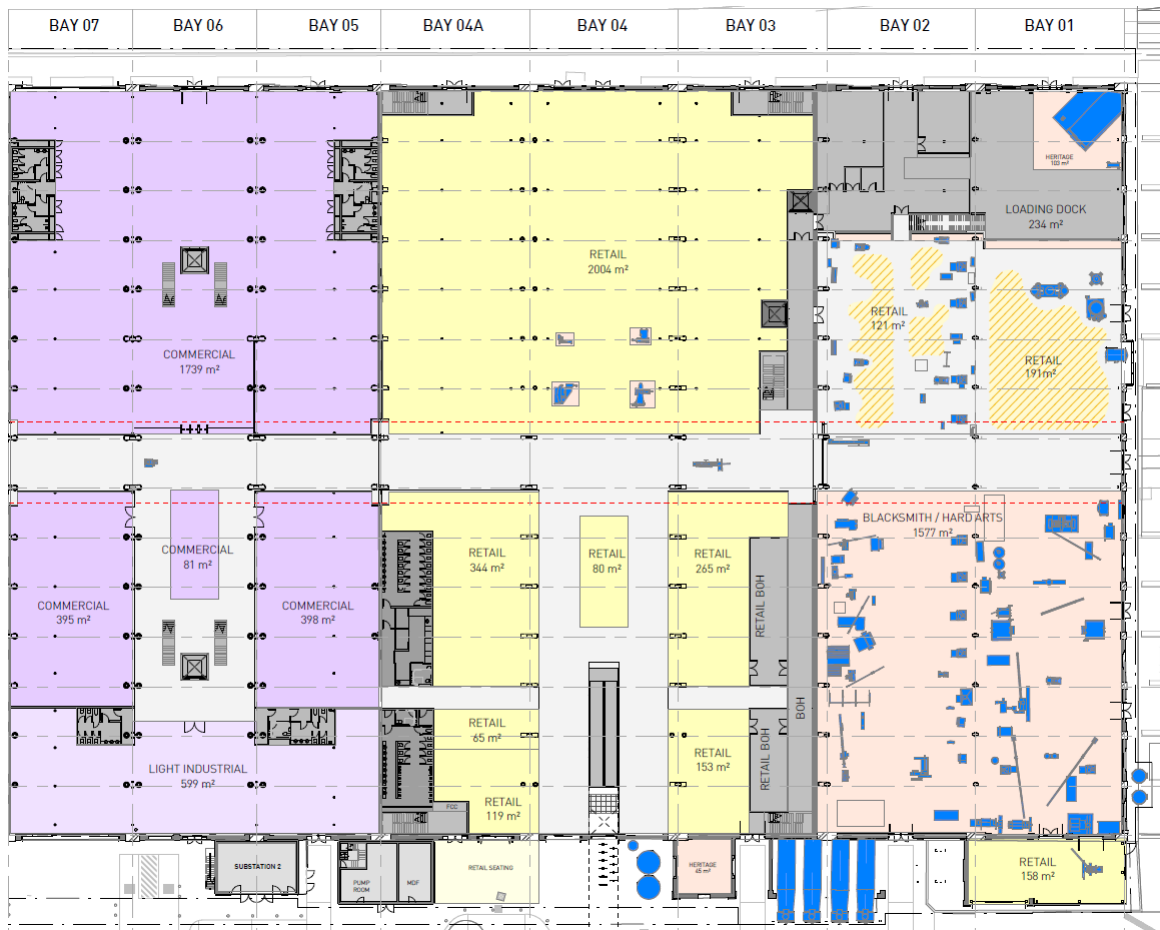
Ground floor plan, SA-AR-DWG-BB-B4-0290 [A]
